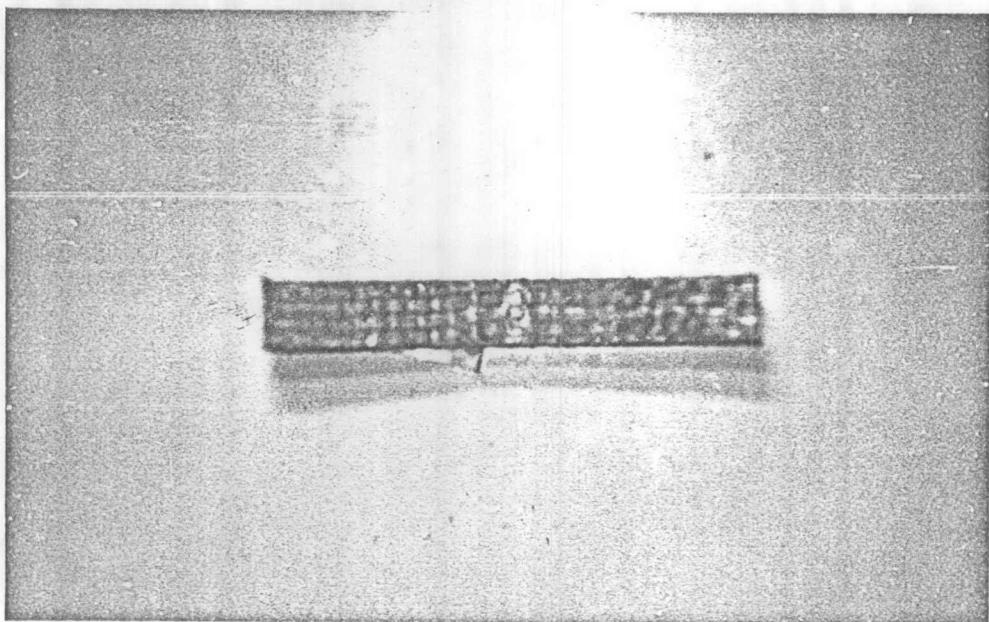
TEST SPECIMEN FOR JRP AFTER FLEXURAL TEST
